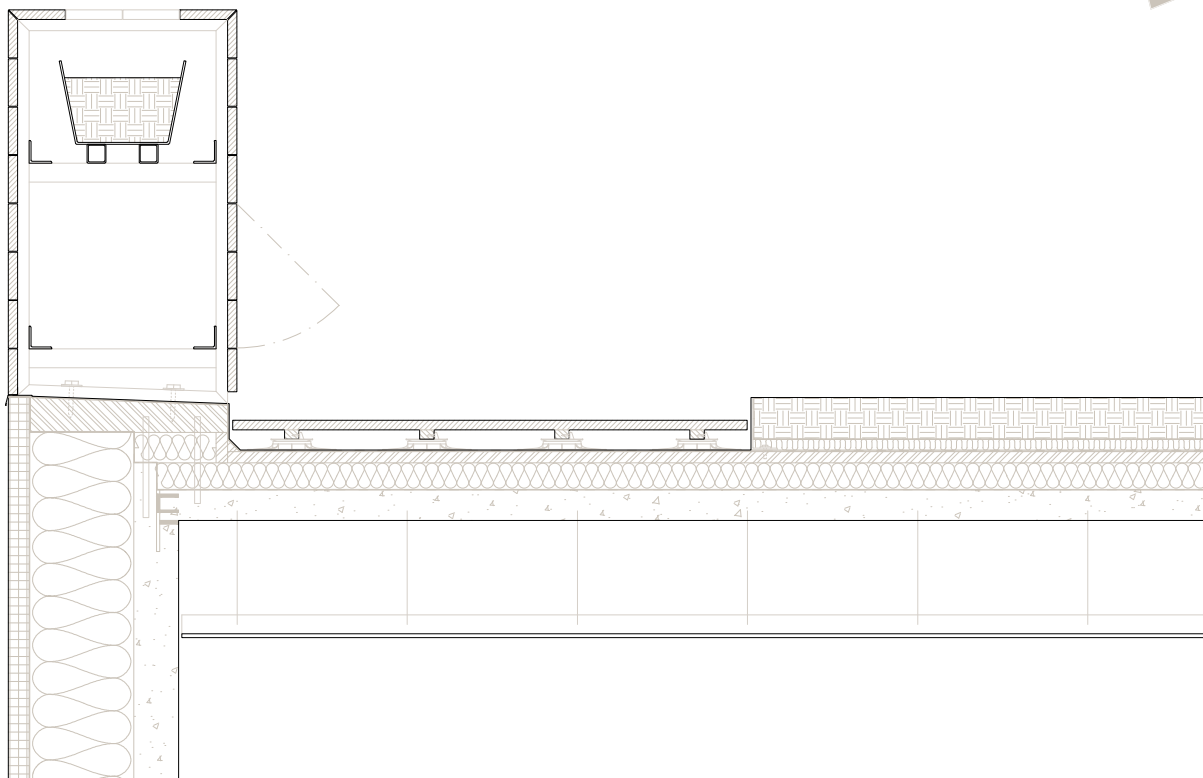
Sketches: Terrace syphonic drainage outlet installation
